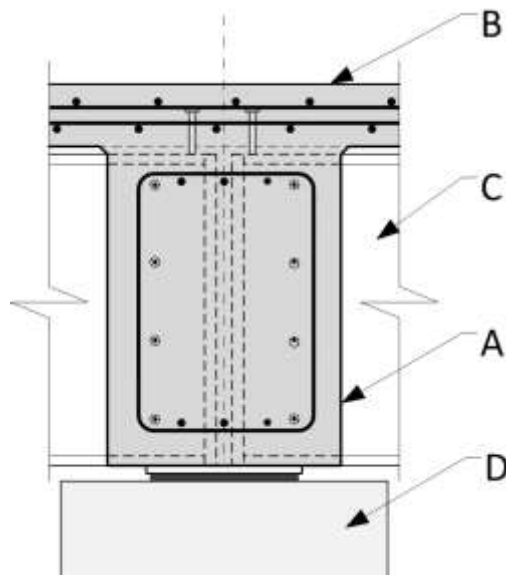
Girder Connection Specimens Tested at University of Nebraska-Lincoln (Farimani M., 2006)
